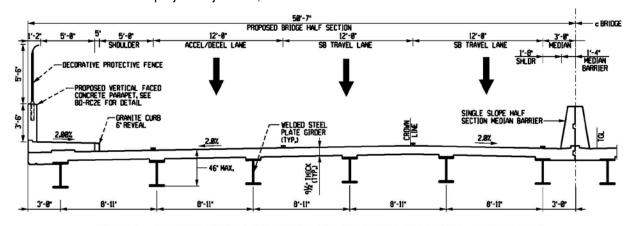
PROPOSED BRIDGE HALF SECTION FOR THE BRIDGE REPLACEMENT ALTERNATIVE 3
